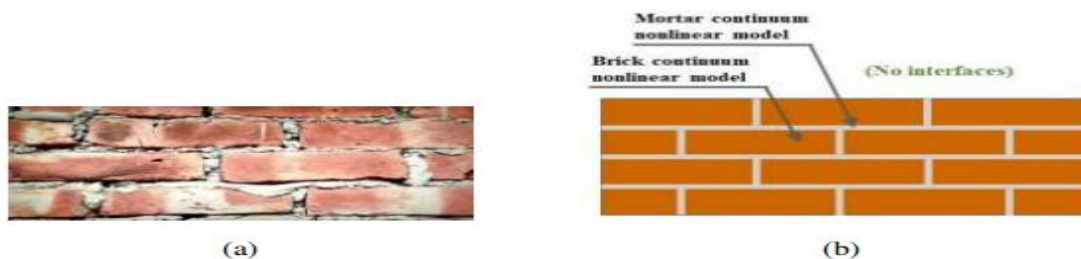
Modeling main strategy for brick walls a) brick wall segment, b) simplified-micro modeling.
